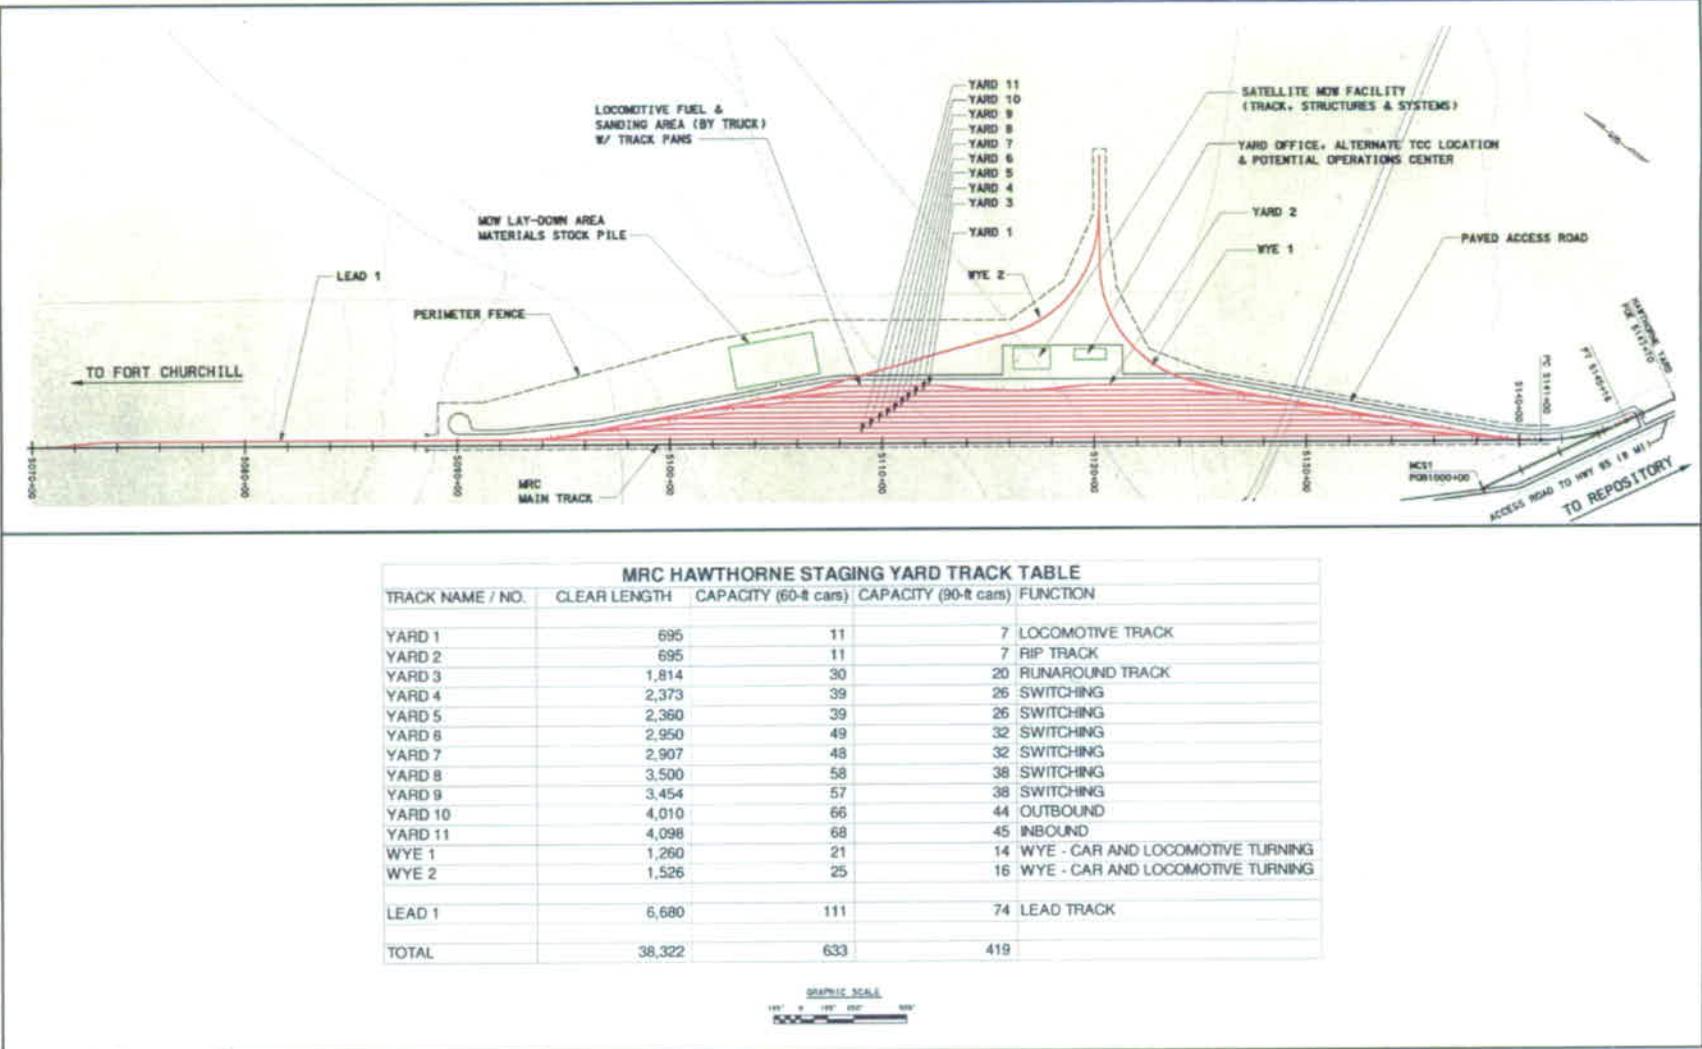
B. MRC Hawthorne Staging Yard – Site Plan
